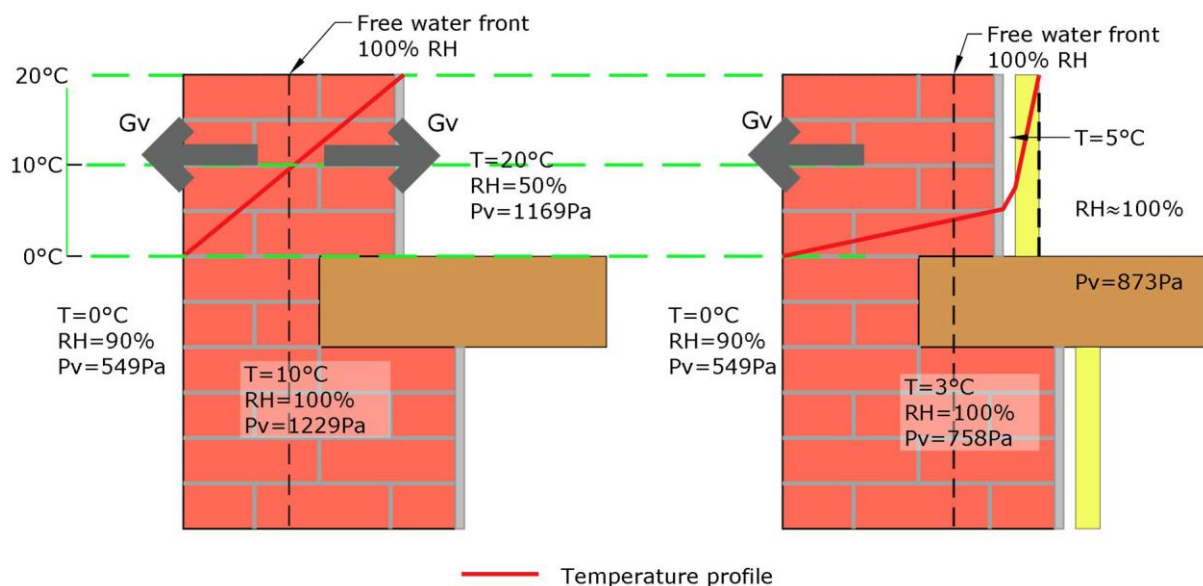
Accumulation and diffusion in a brick wall without insulation (left) and with conventional insulation (right) (Layout)
